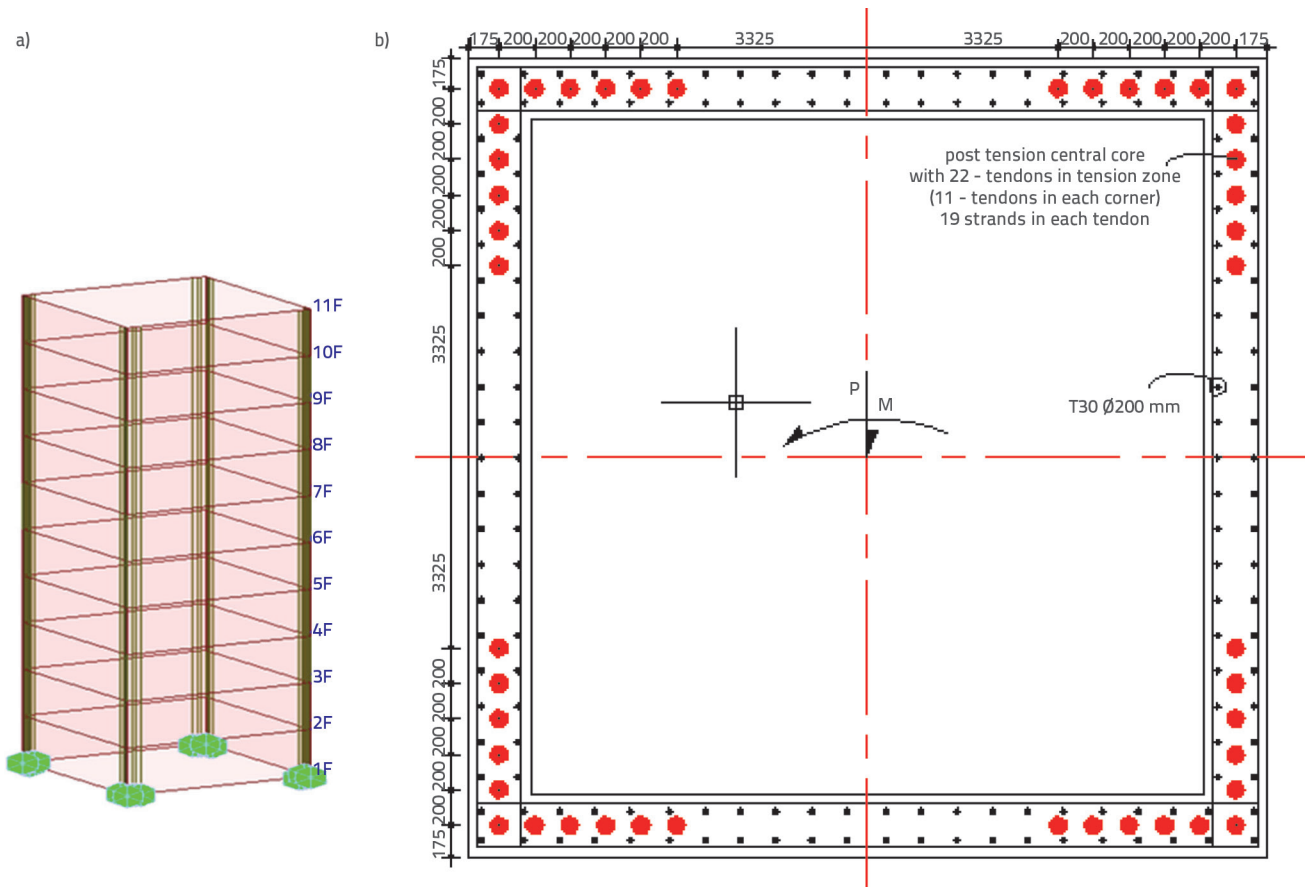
a) Elevation of 10-story core wall from 40-stories with straight post-tension tendons; b) post-tension core wall section reinforcement detail
